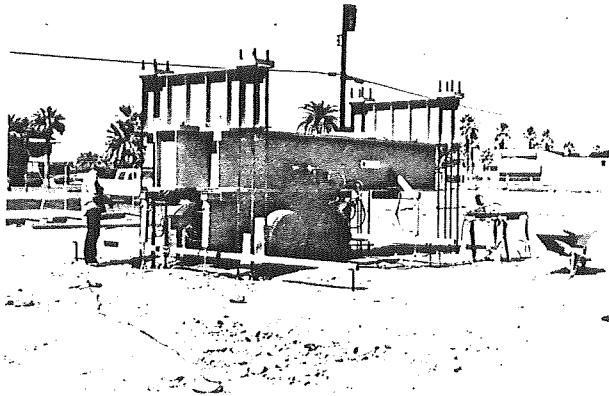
MOBILE LOAD FRAME ANCHORED INTO LOAD TESTING POSITION FOR APPLIED LOADING INCREMENTS UP TO 1000 TONS AND SHOWING ANCHOR ROD CONNECTION WITH HIGH STRENGTH THREADED COUPLERS AT GROUND LEVEL.
